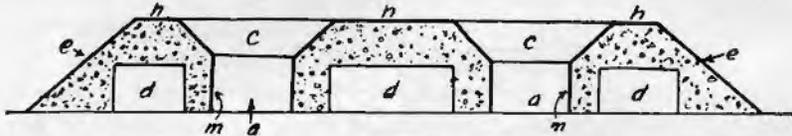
Horizontal cross-section of mortar emplacement.
